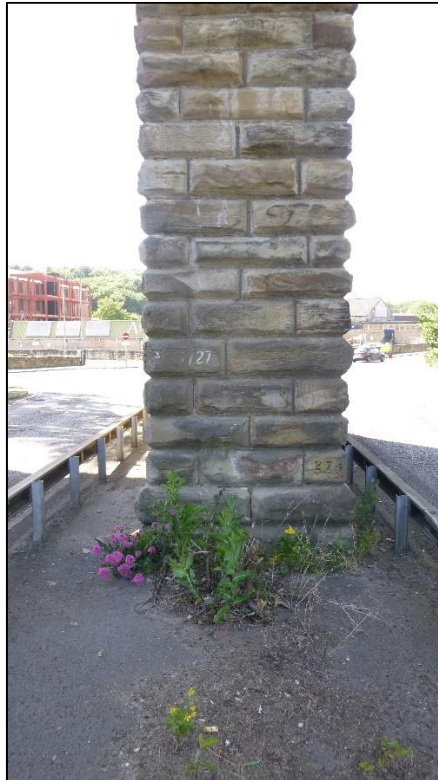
Plinth at base of pier between Spans 13 and 14. View facing west (0503.JPG)
